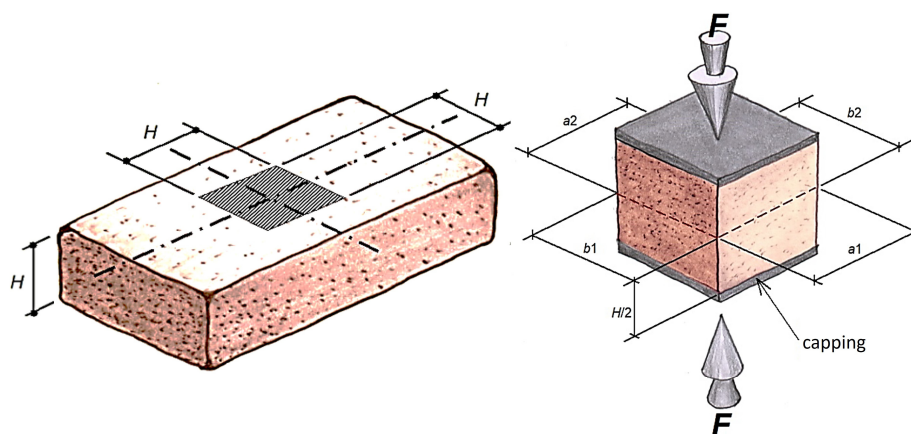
Sectioning and measurement of the dimensions of the fracture section of the test specimen. Source: adapted from ABNT NBR 16814:2020.
